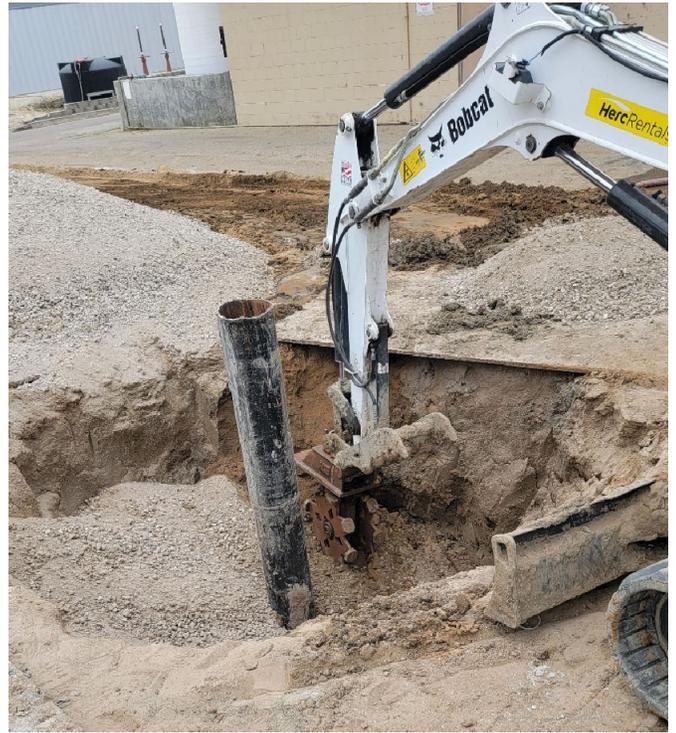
Backfilling and compacting sinkhole after excavating liquefied soils.
